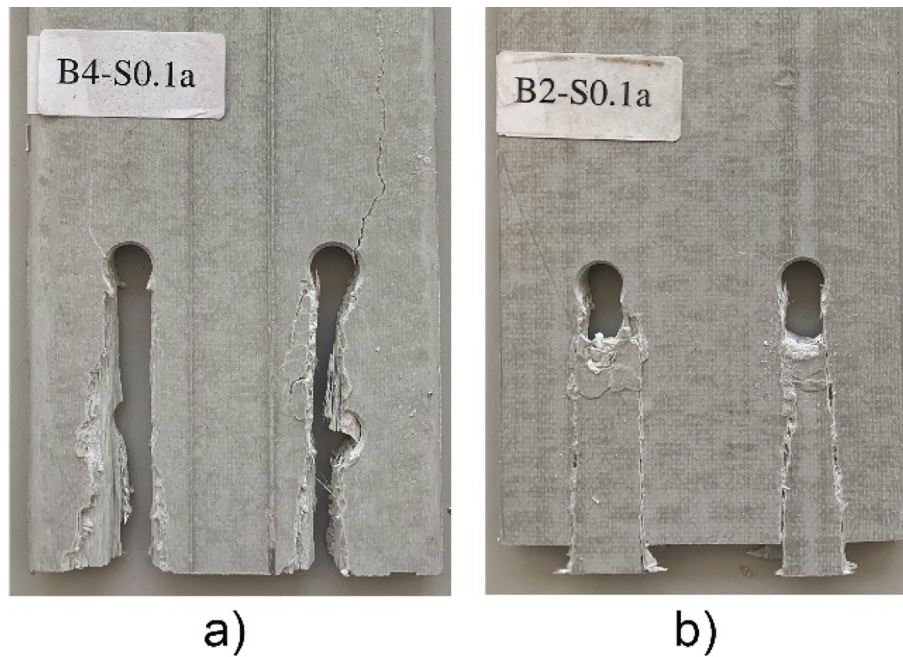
Combined crushing and shear-out failure modes of bolted joints under monotonic loading, a) B4-S0.1a, b) B2-S0.1a.
